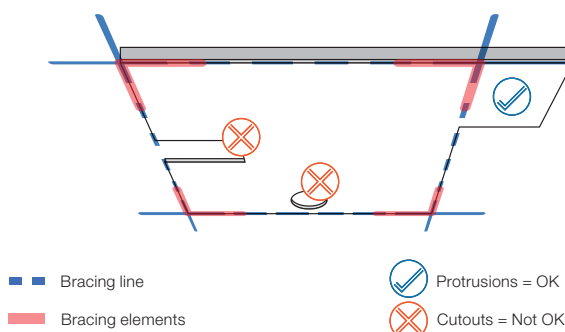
DIAPHRAGM BRACING LINING SPACINGS
